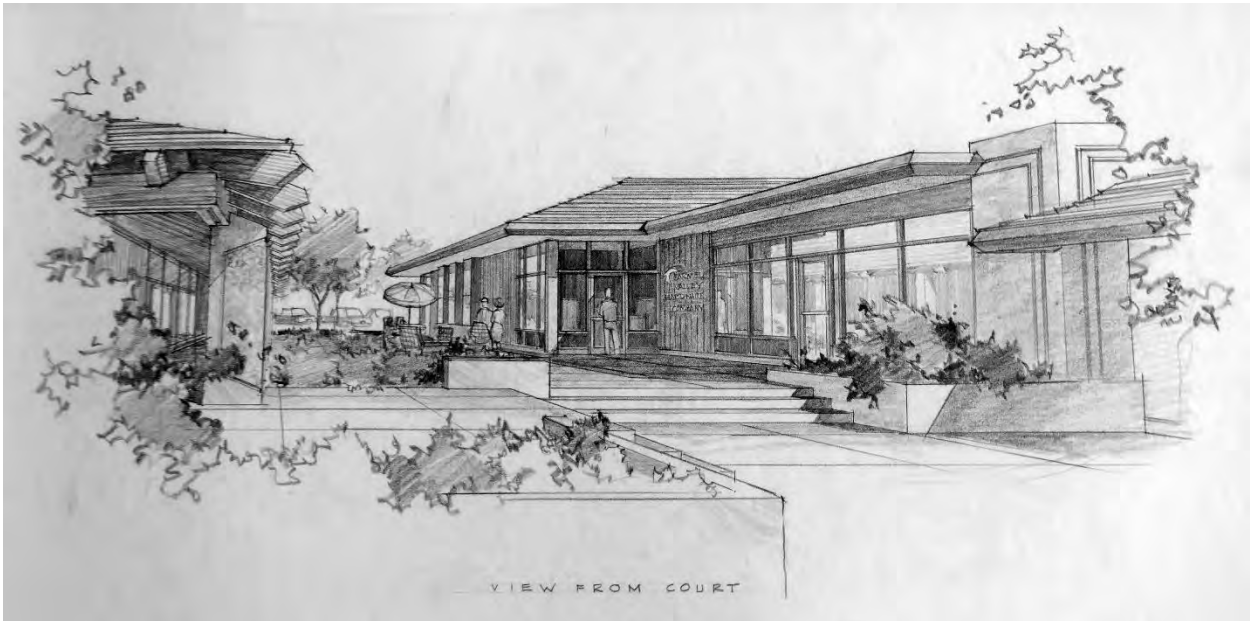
1976 drawing by Olof Dahlstrand, depicting proposed design of Building B, looking southeast across northwest façade. Building C is at the left. Source: CED.
